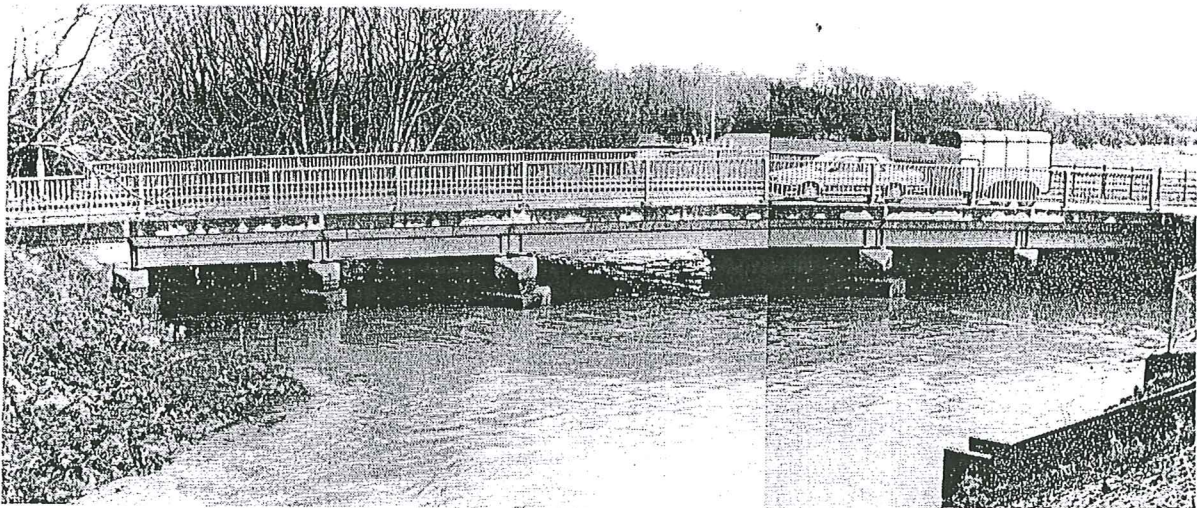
DOW BRIDGE AND BOUGHTON ROAD BRIDGE
